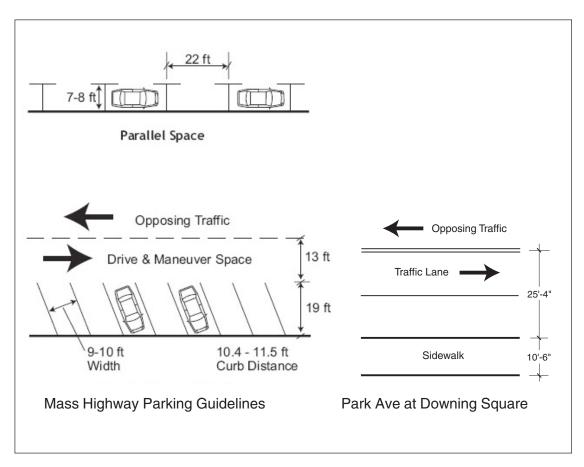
Mass Highway Parking Guidelines and Park Avenue Measurements
